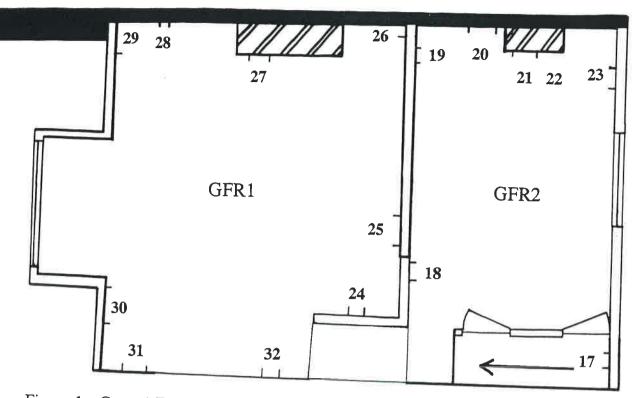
Ground Floor Sketch Plan. Showing location of investigative openings.
